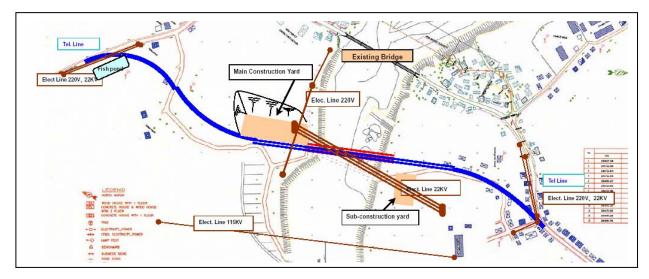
Candidate Construction Yards & Public Facilities to be Relocated
